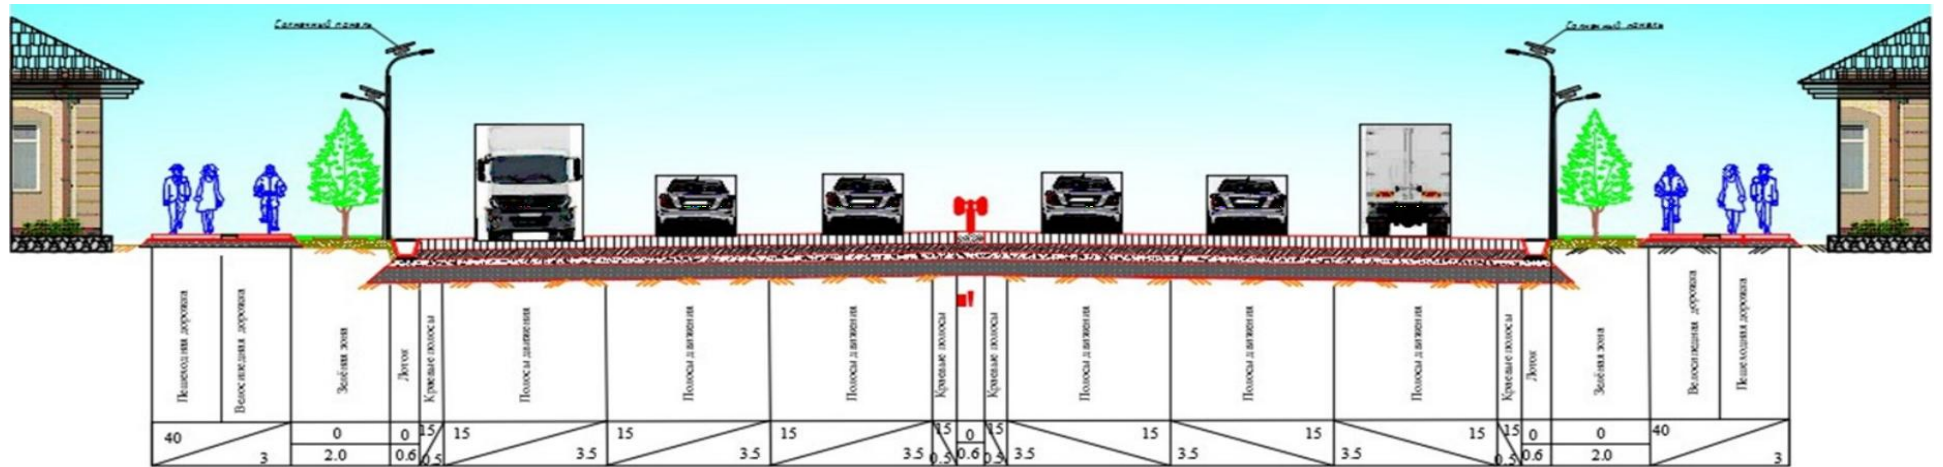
Type 2 Option-2 Designed cross-section of the road in Kumkurgan, bypass road
